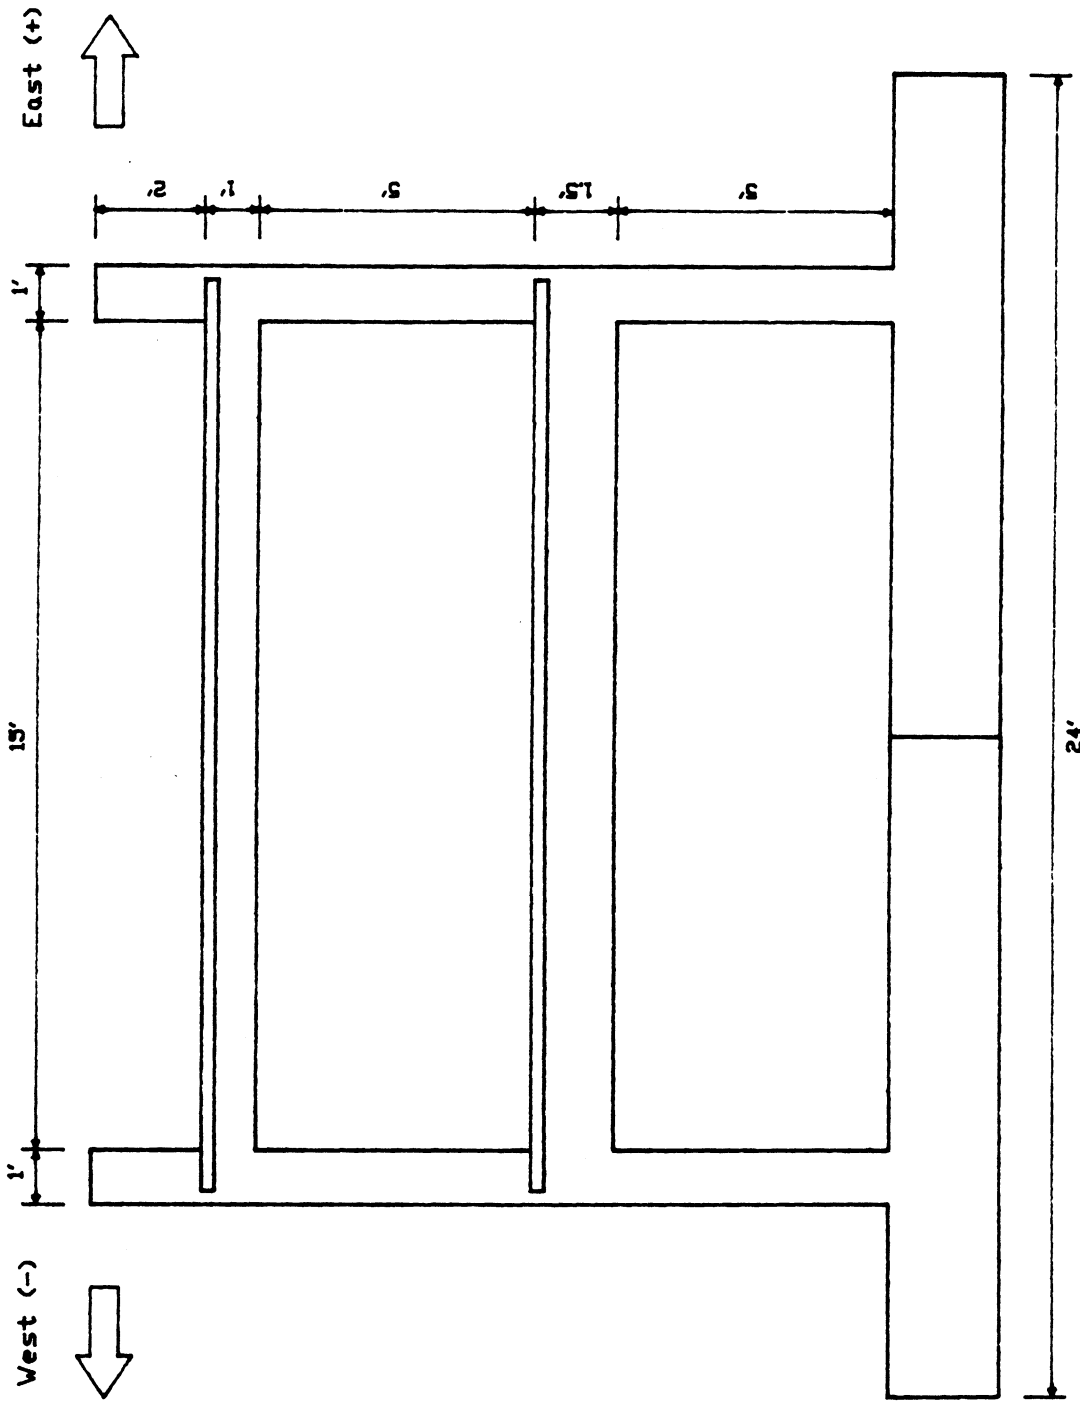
Dimensions of The Original Frame Test Specimen
